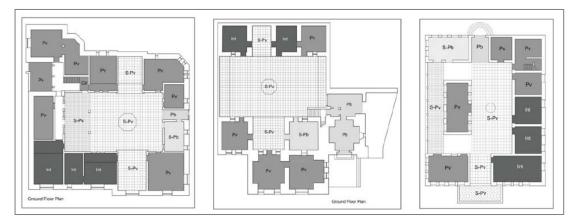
Horizontal separation between living rooms and bedrooms through courtyards in single-floor houses
